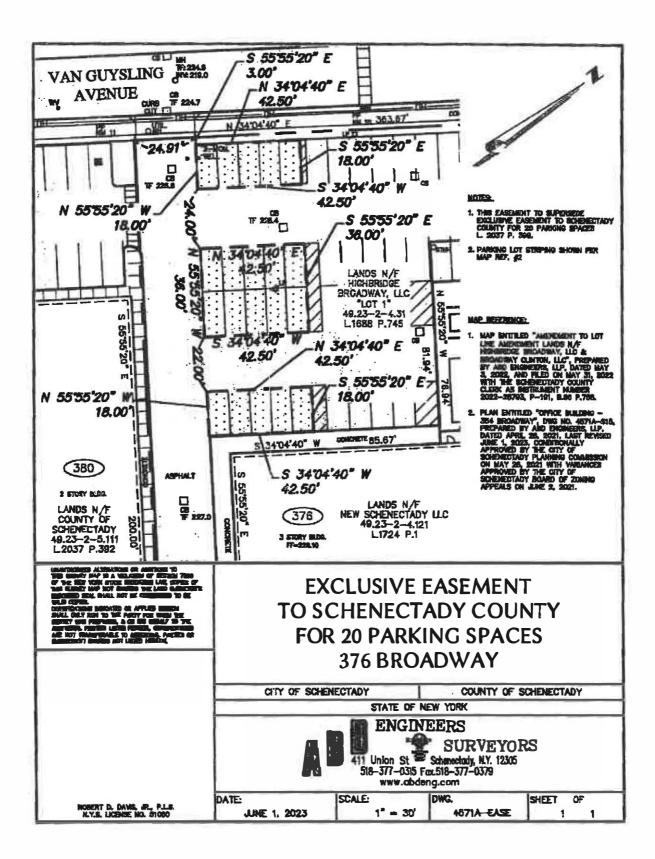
New Location Access to 20 Parking Spaces
